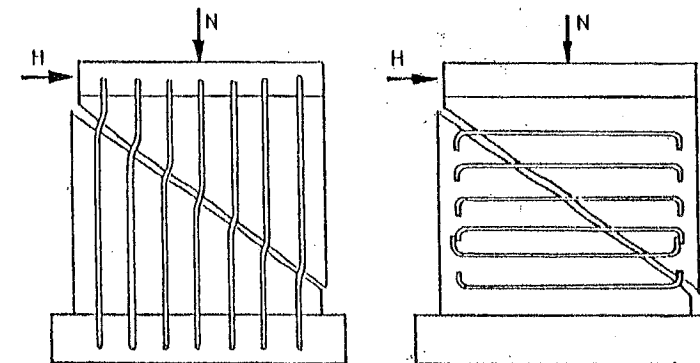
Mechanism of reinforcement action at shear failure of a reinforced masonry wall [2]
